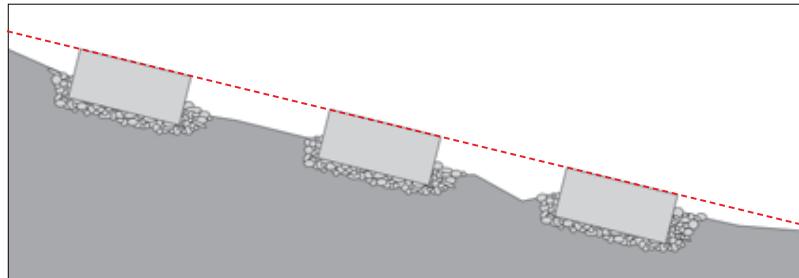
2 (aligning the concrete foundations on a gravel bed)
